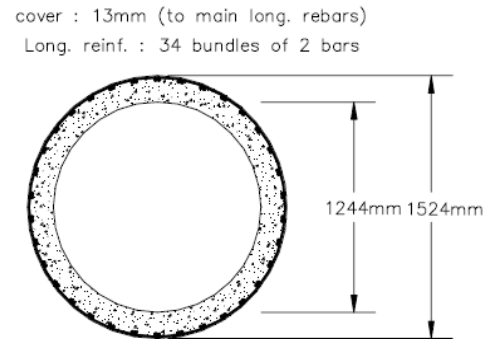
Cross section of Ranzo and Priestly Specimens [6]
